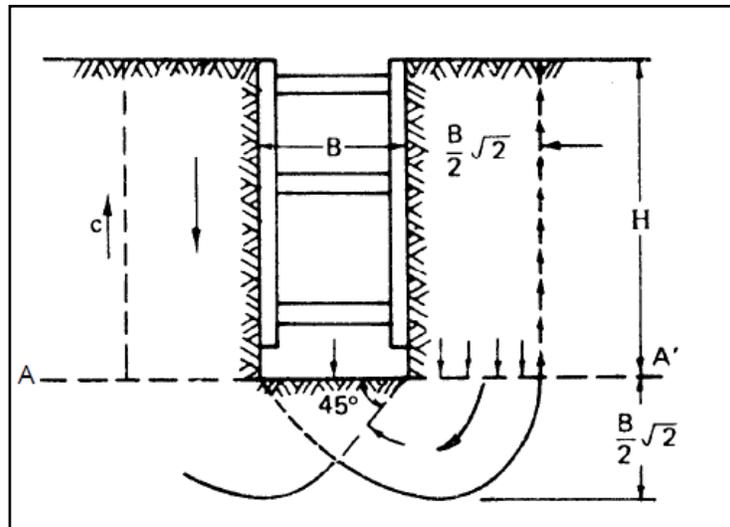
Diagram illustrating assumed mechanism for failure by heave of the bottom of a deep excavation
